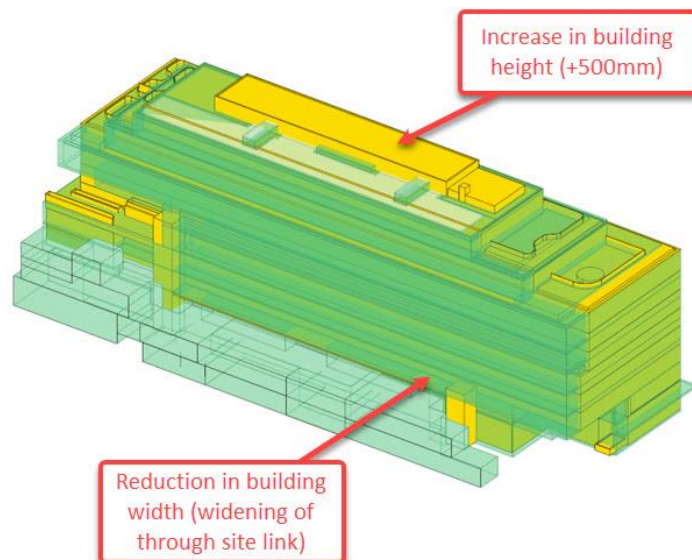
Fig Street Building: Wattle Street elevation showing reduction in building width
